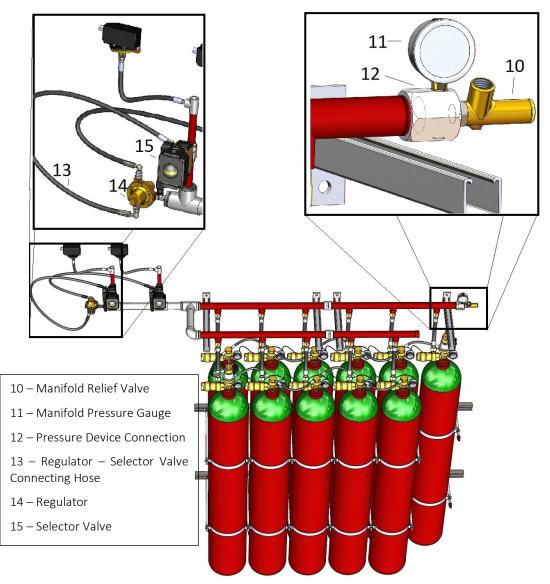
Basic selector valve system with additional parts unique to the selector valve system labelled
